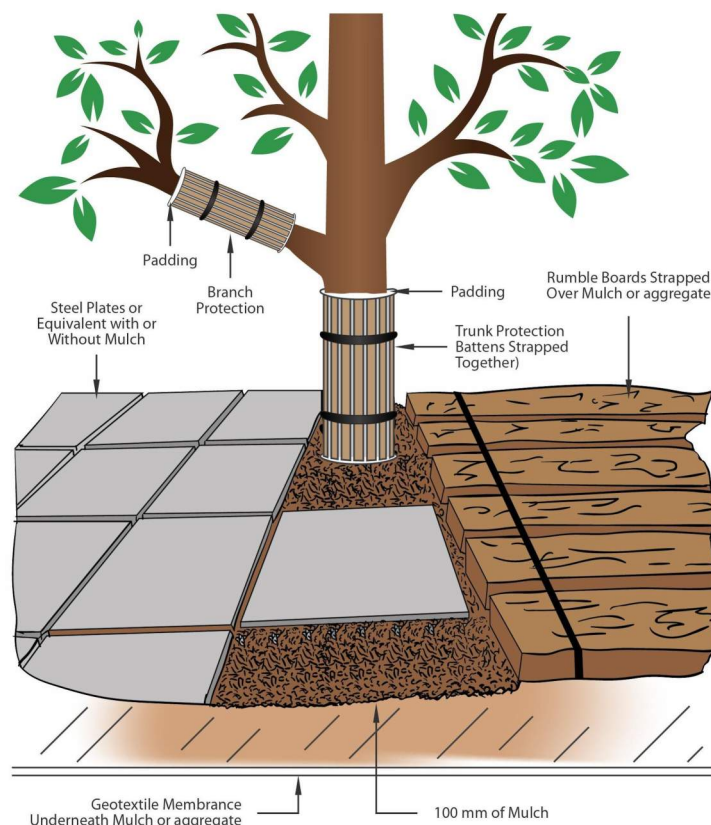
Details of trunk, branch and ground protection. (Standards Australia, 2009)
